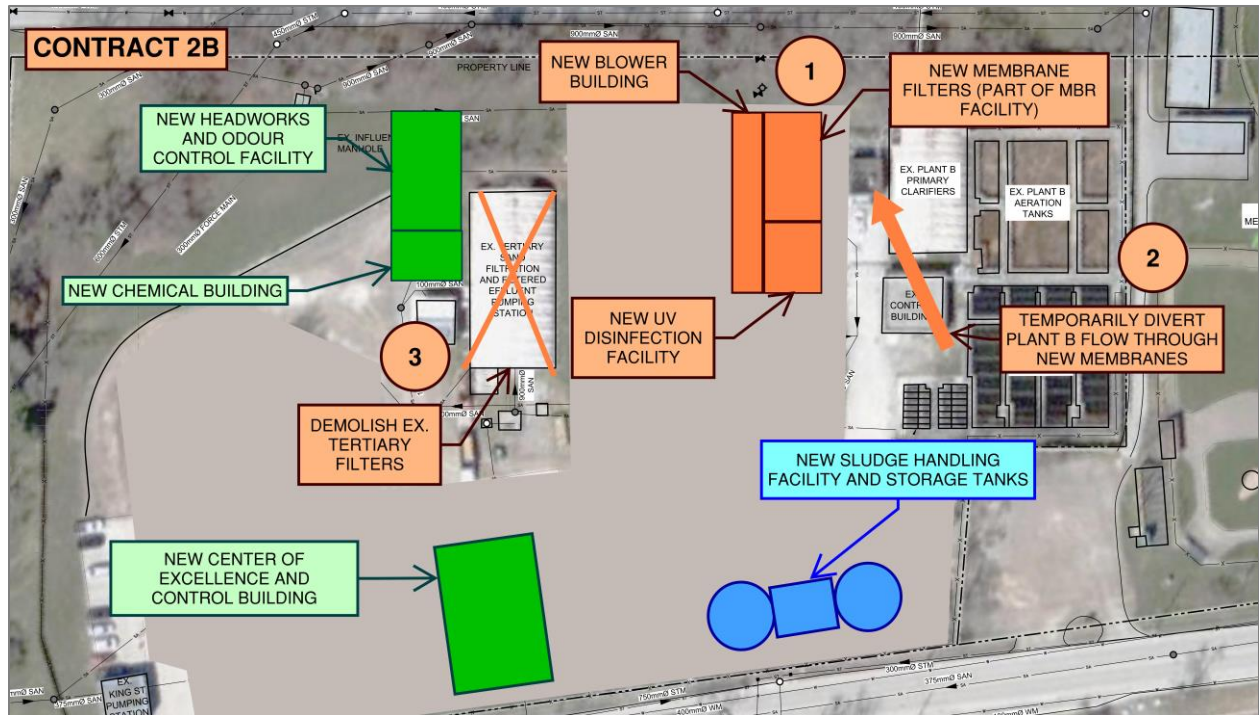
Site Layout A Implementation - Conceptual Contract 2B
